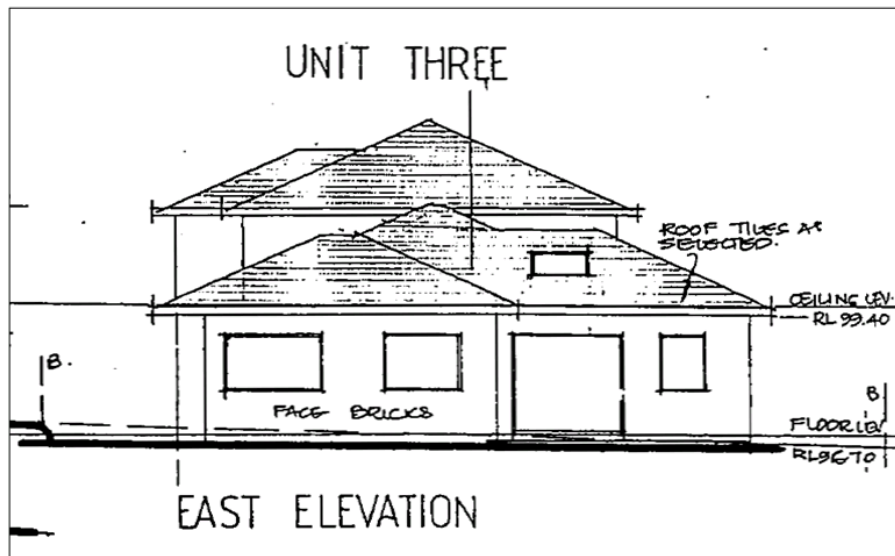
Proposed East Elevation (rear) of 2 Waratah Street
